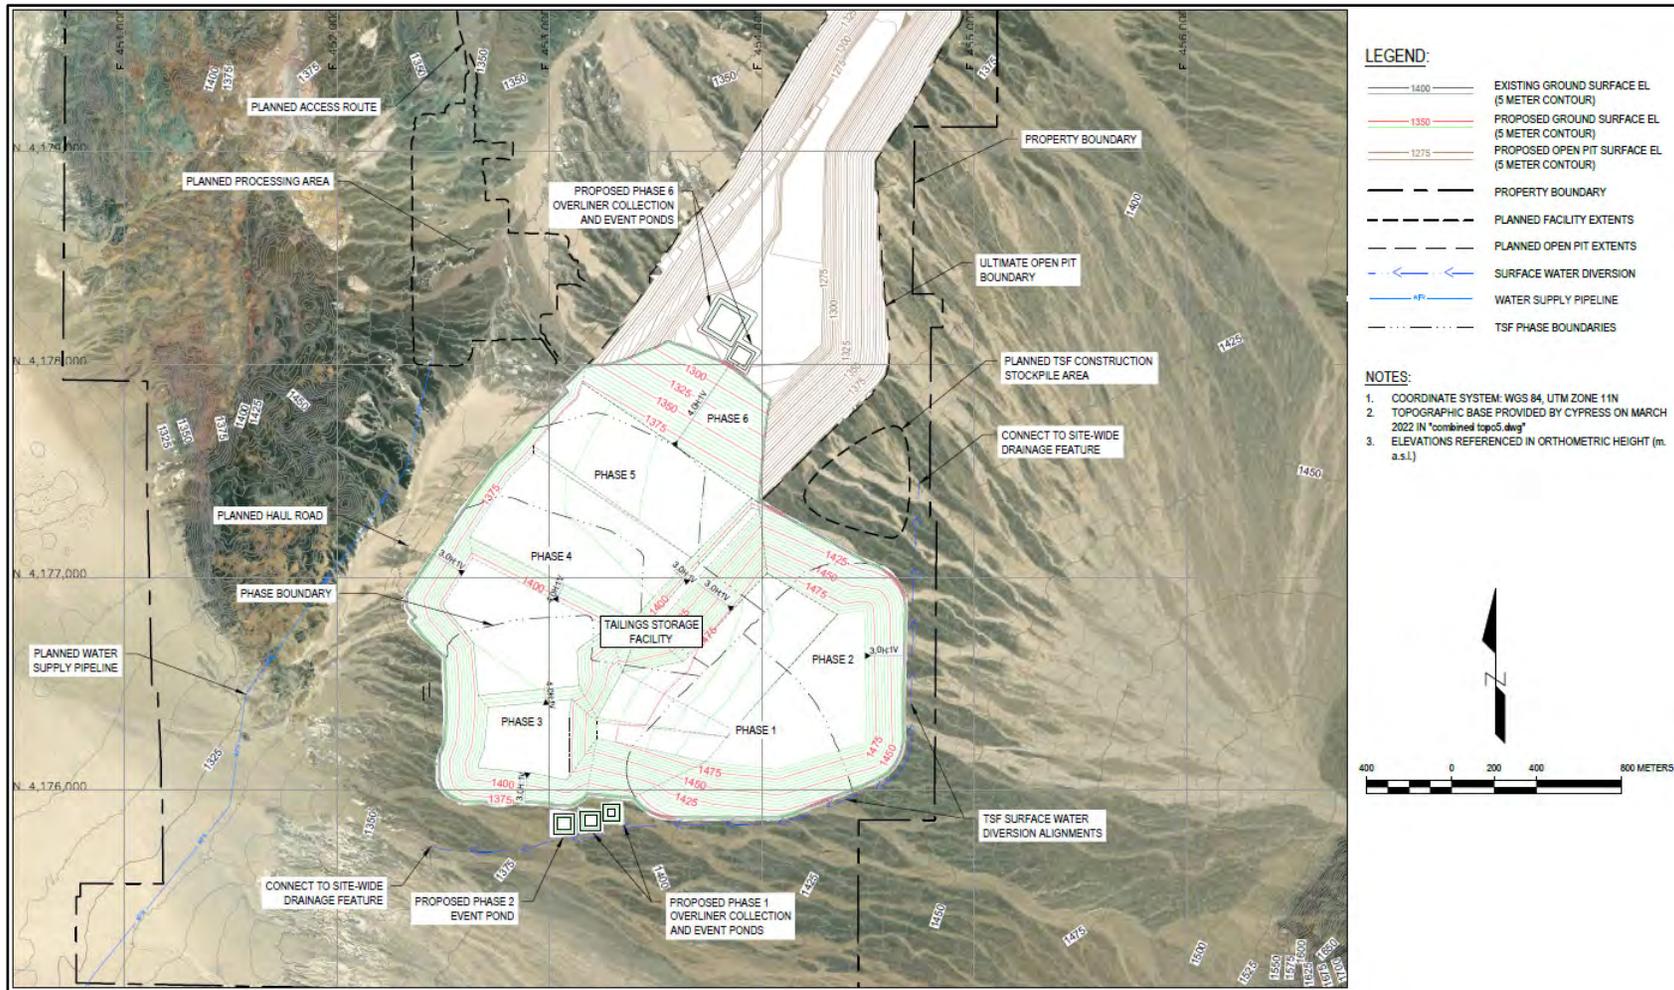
Tailings Storage Facility Plan (Source: WSP, 2023)
